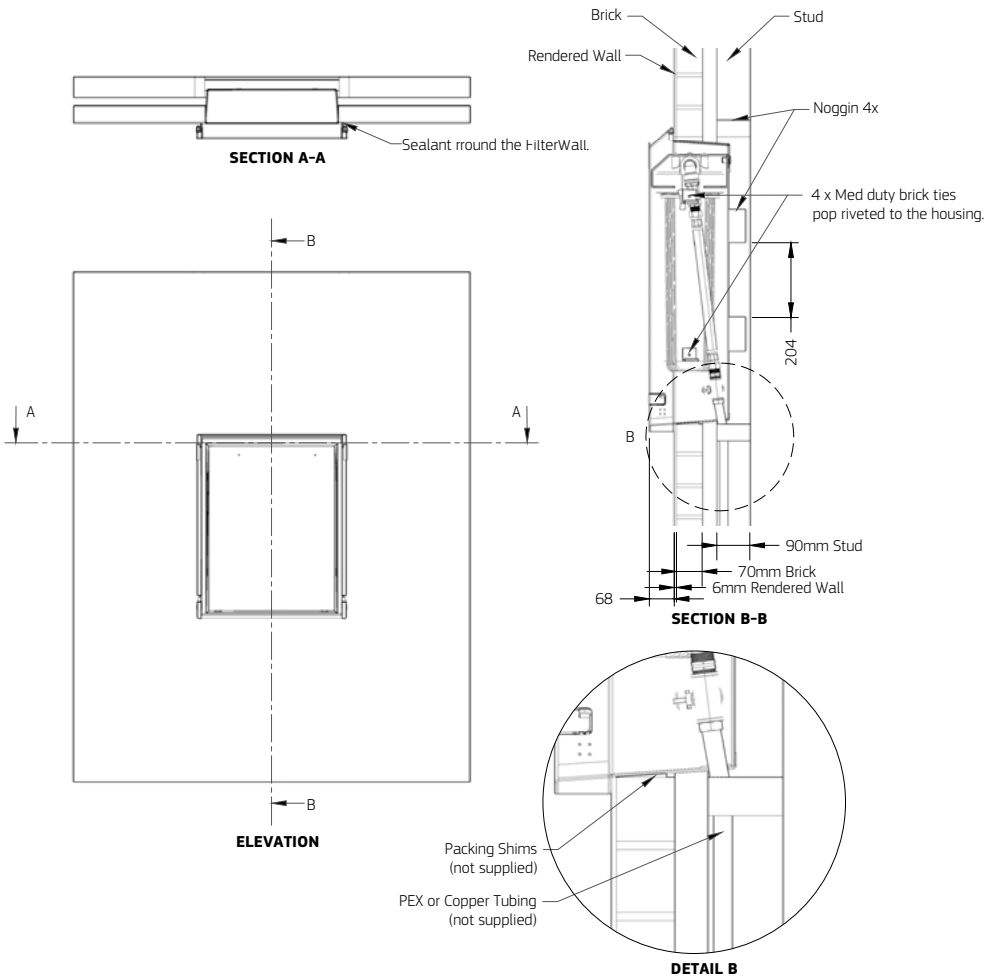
Builder Plans for 70mm Rendered Brick, Brick Tie
